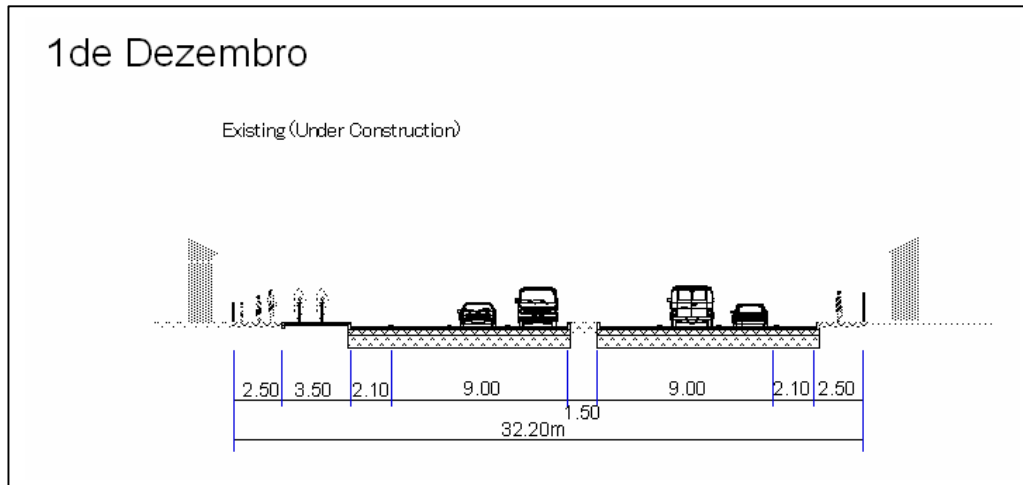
Typical Cross Section of Primeiro de Dezembro Project
